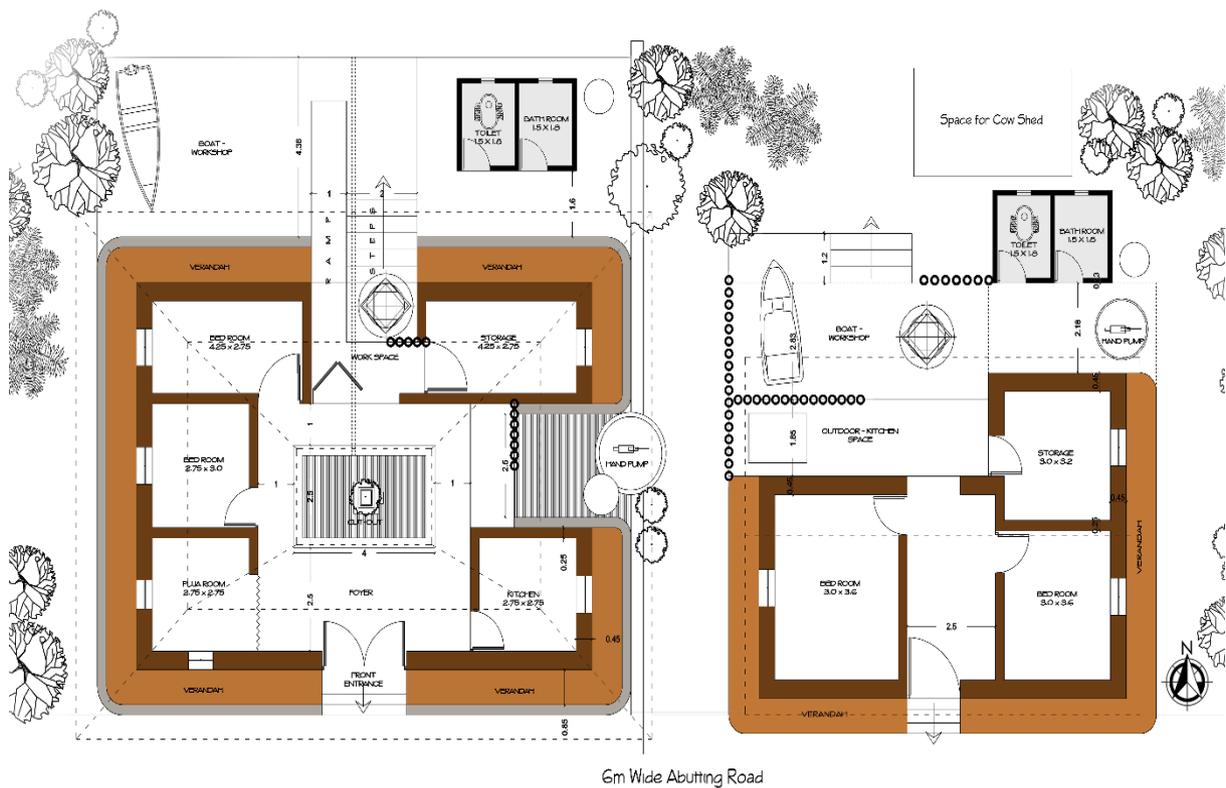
Existing typical floor plans of fishermen houses (Kutchha house), 2019. Source: (Author).
